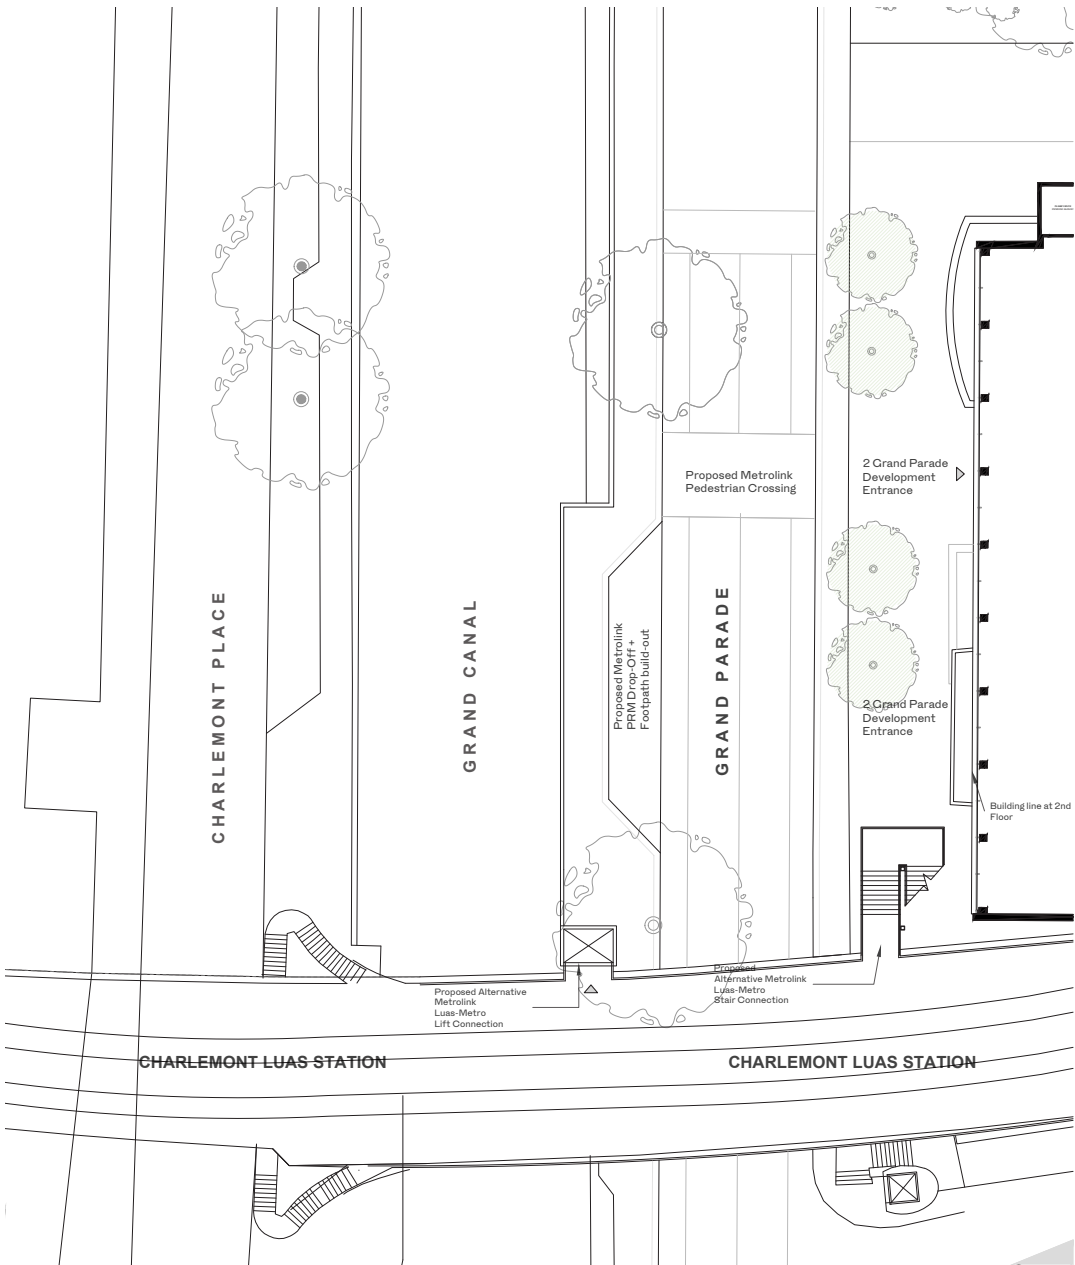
F Proposed design intent at second floor for the reconfigured stair and lift.
